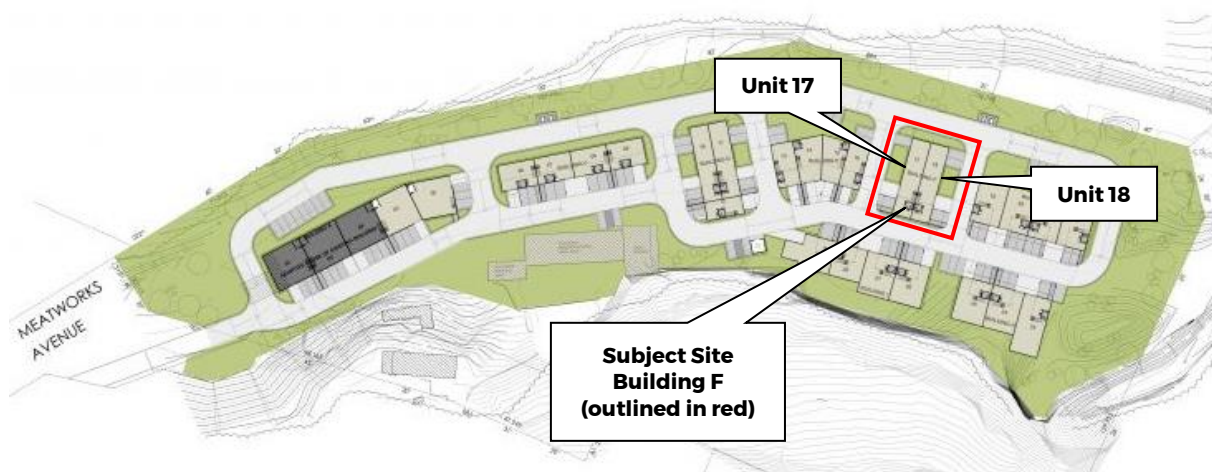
Approved Existing Site Plan under DA2021/0385, prepared by Strutt Studio; Unit 17 and 18 (outlined in red)
